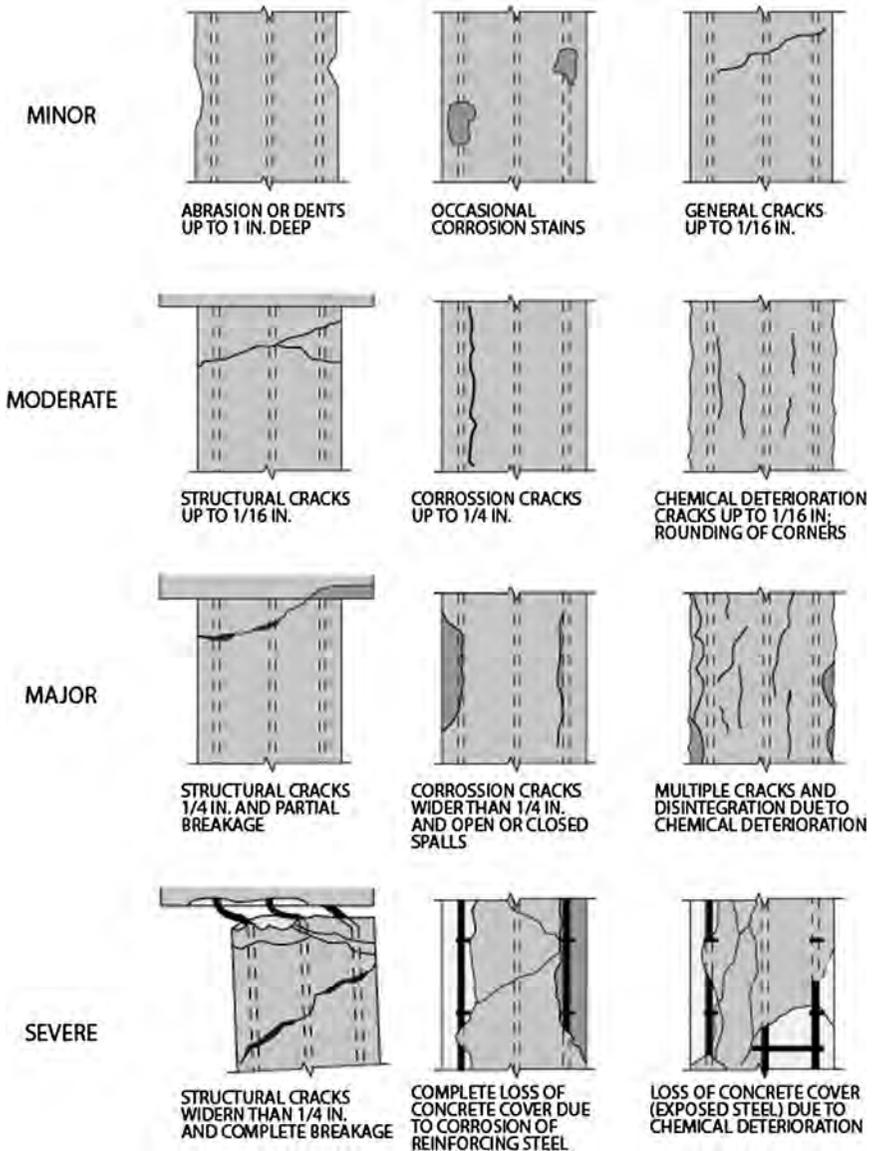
Damage ratings for reinforced concrete elements
